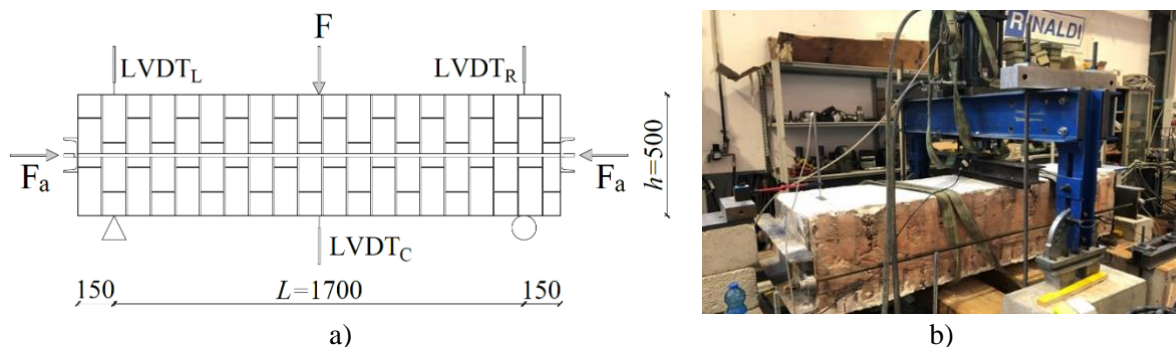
a) Sketch of the three-point bending test set-up and b) specimen F_R_1 before testing (dimensions in mm)
